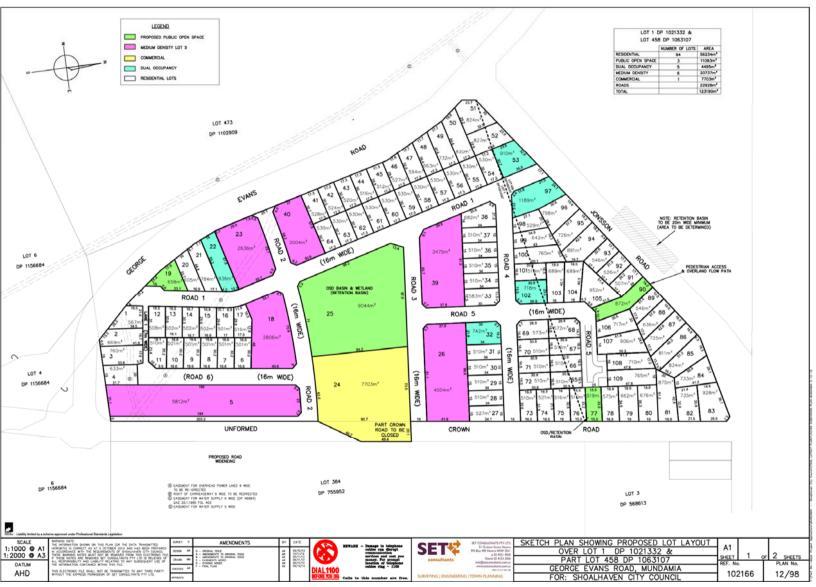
Planned layout of Mundamia Subdivision (courtesy of SET Consultants)
